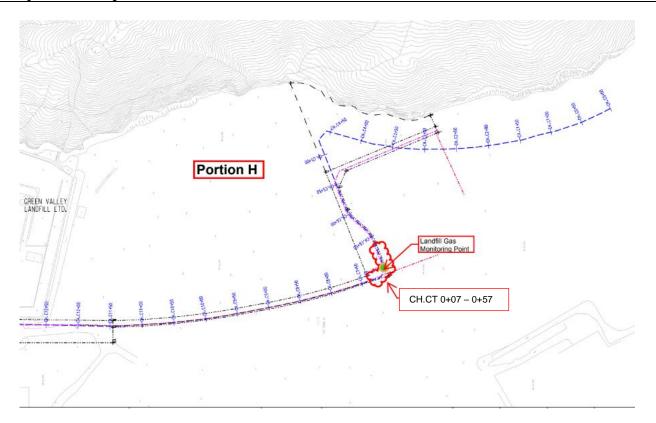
Location Plan for CH.CT 0+07 – 0+57
